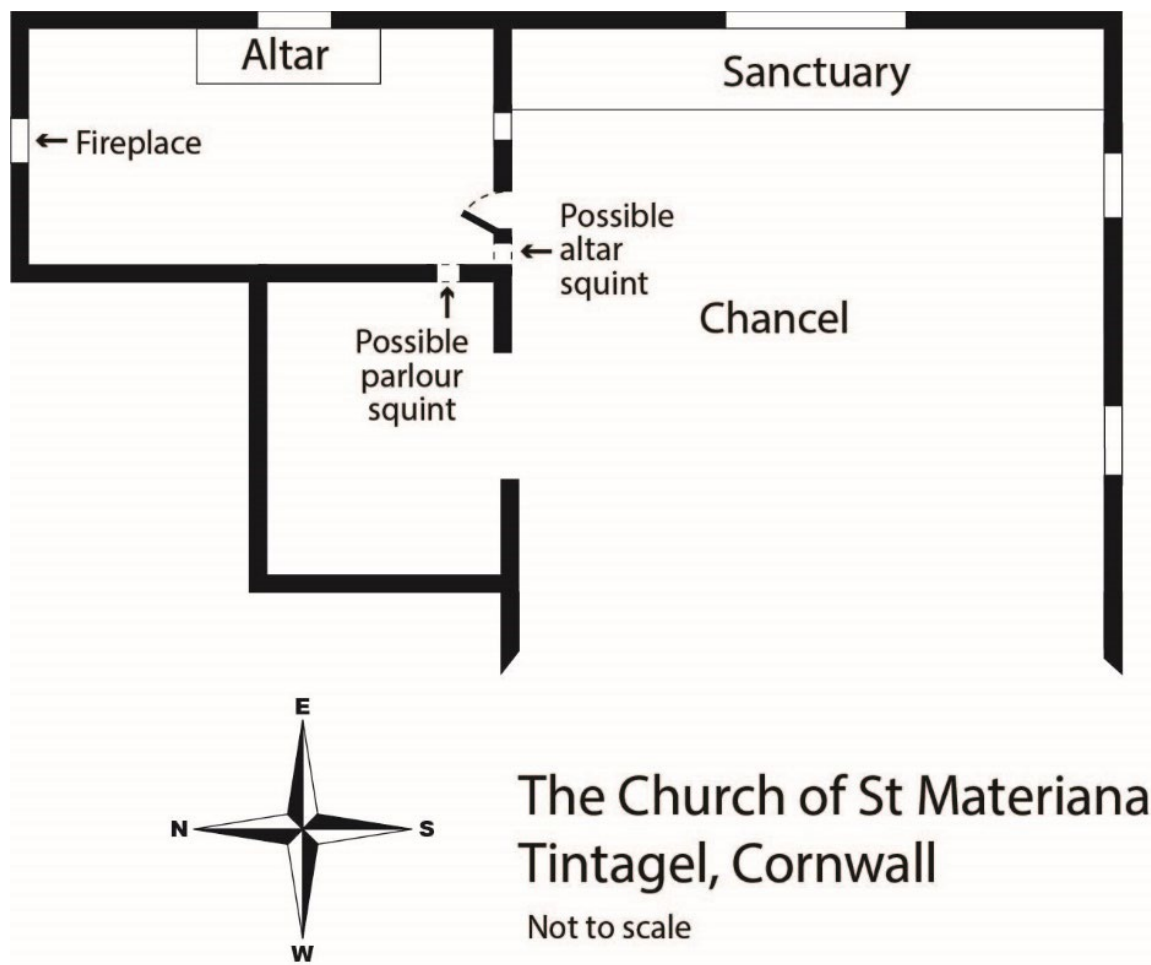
Floor plan of the anchorite cell of St. Materiana, Cornwall.
